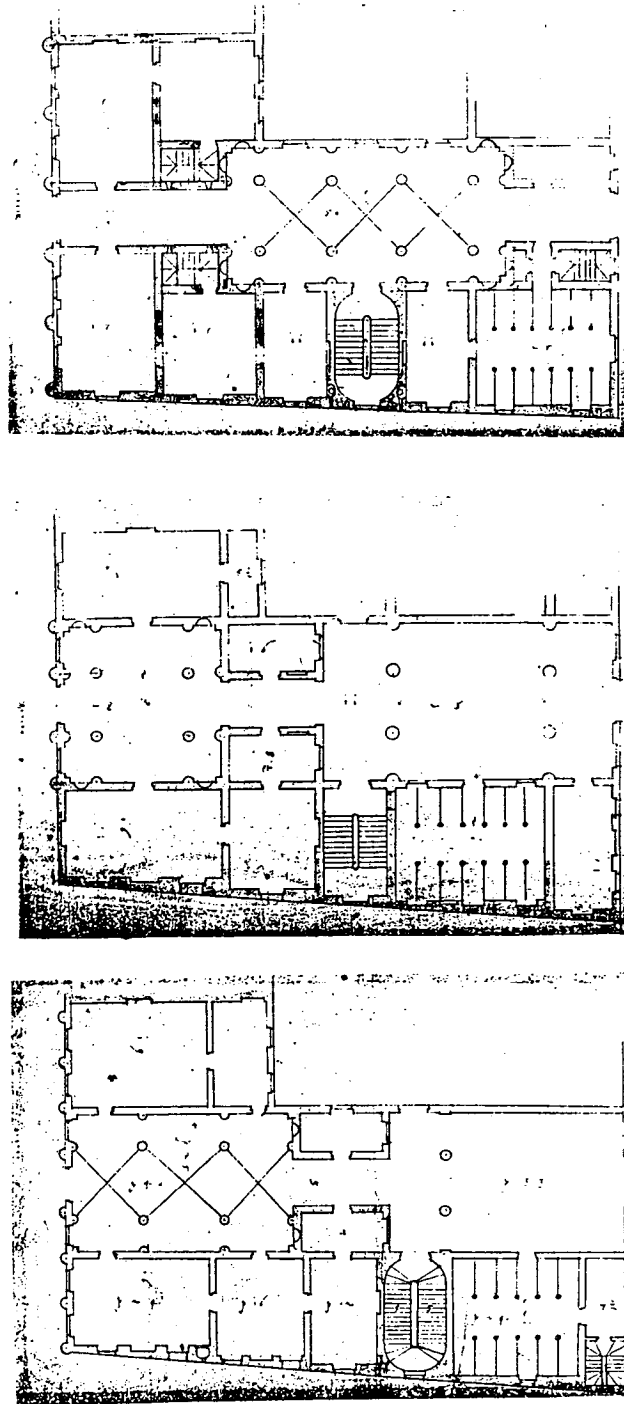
Andrea Palladio: three alternative plans for Palazzo Barbarano (RIBA XVI/14 A, B and C)
